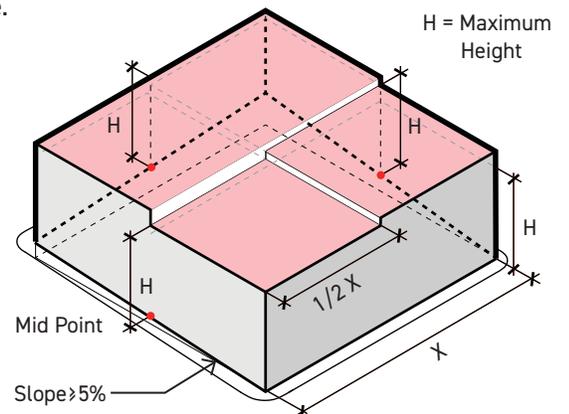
BUILDING HEIGHT ON SLOPE
